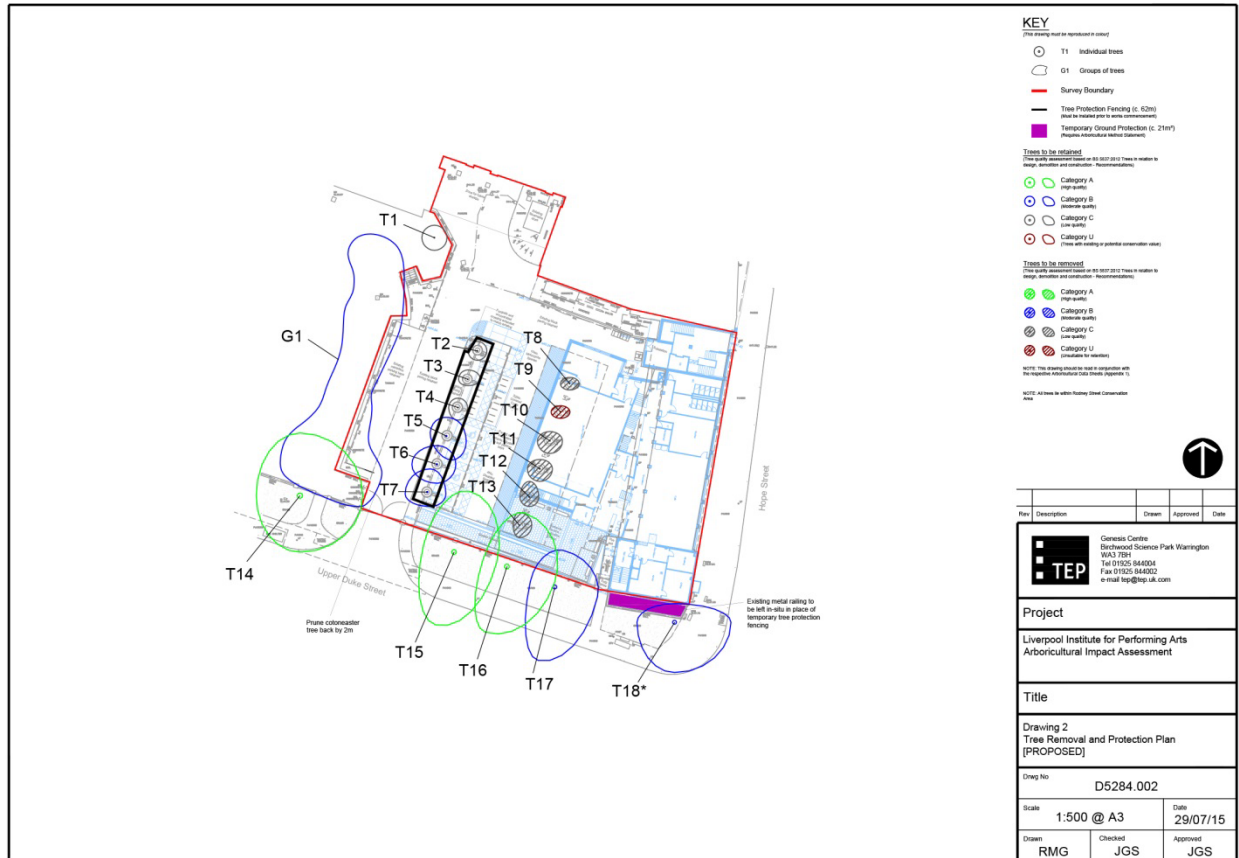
Tree Removal and Protection Plan D5284.002, prepared by TEP
